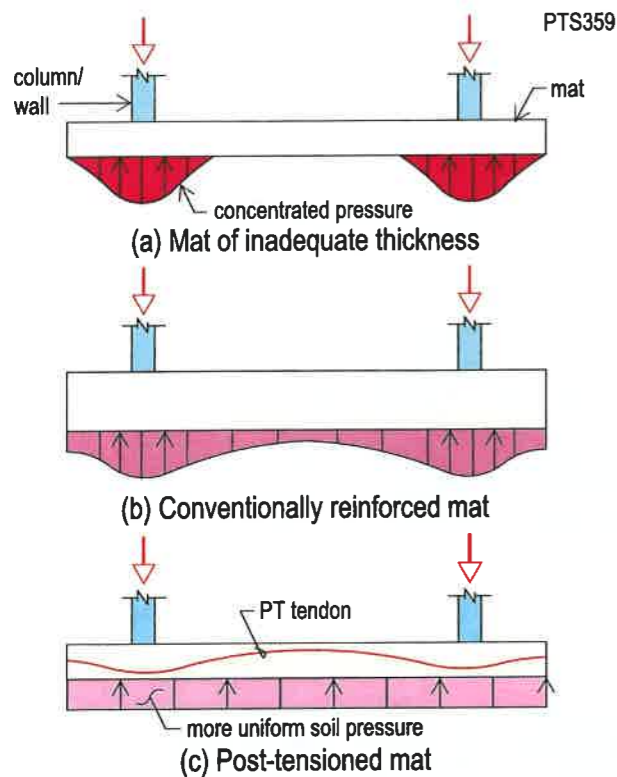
Load Transfer of Conventionally Reinforced and Post-Tensioned Mat Foundations
